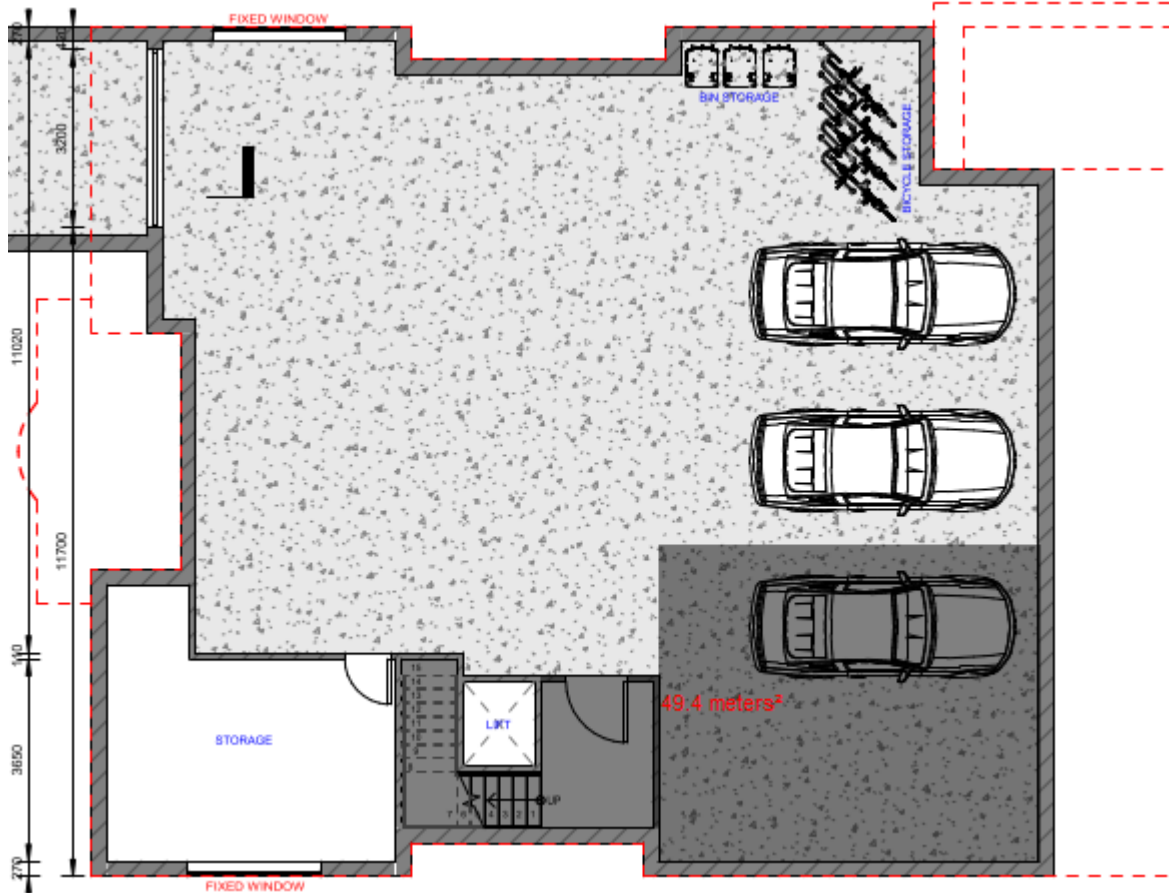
Extract of the basement floor plan (source: Nemco Design, dated 22/09/2020)
